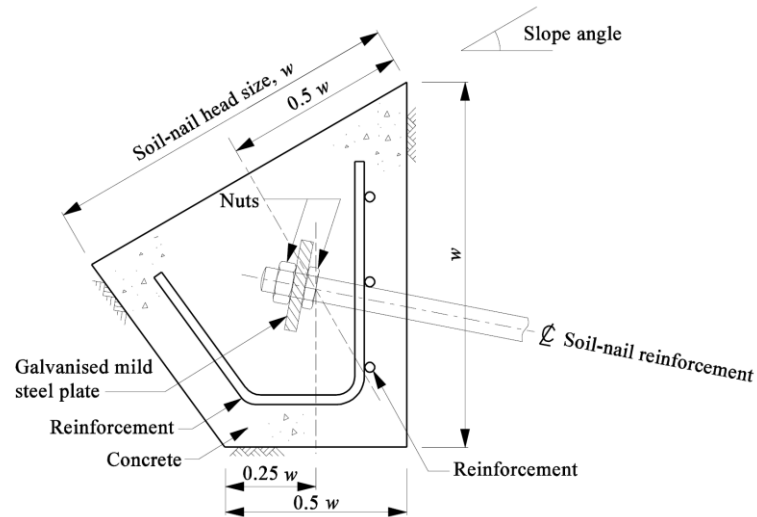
Typical Details of a Soil-nail Head for a Shallower Slope (Geotechnical Engineering Office, 2008)
